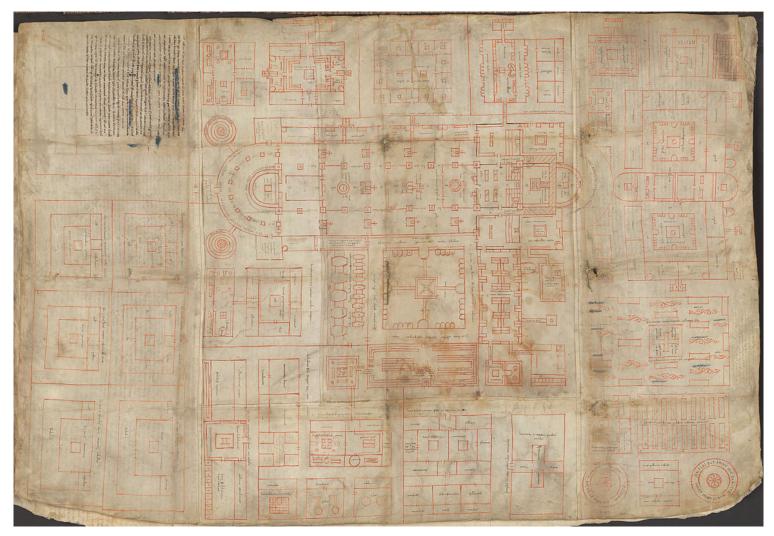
Plan of St. Gall. 9th century monastery plan. Photo. Wikipedia via www.stgallplan.org
